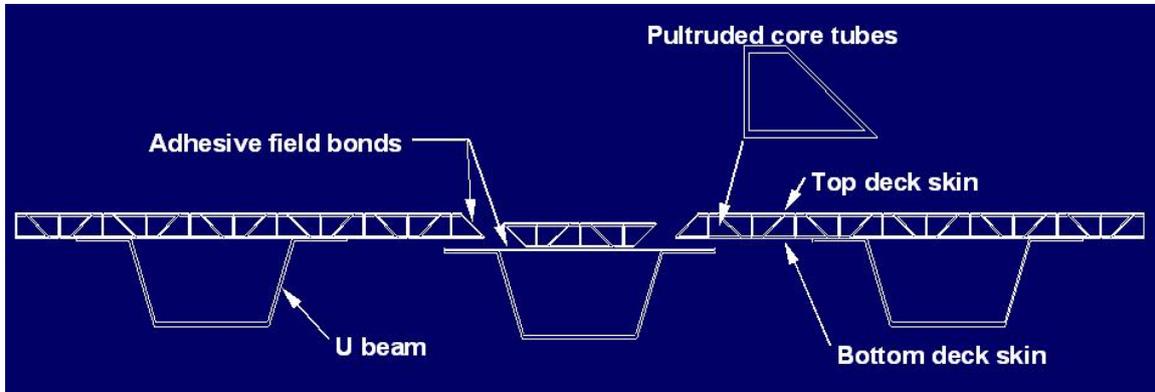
Typical Trapezoidal-Shape Cross-Section.
